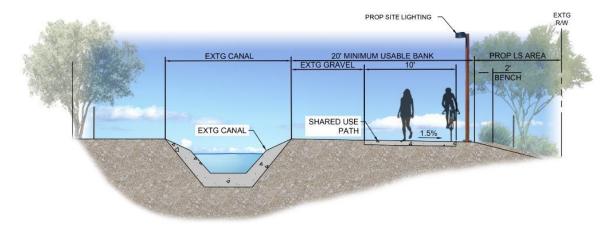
Highline Canal SUP Typical Section - Segment H1
